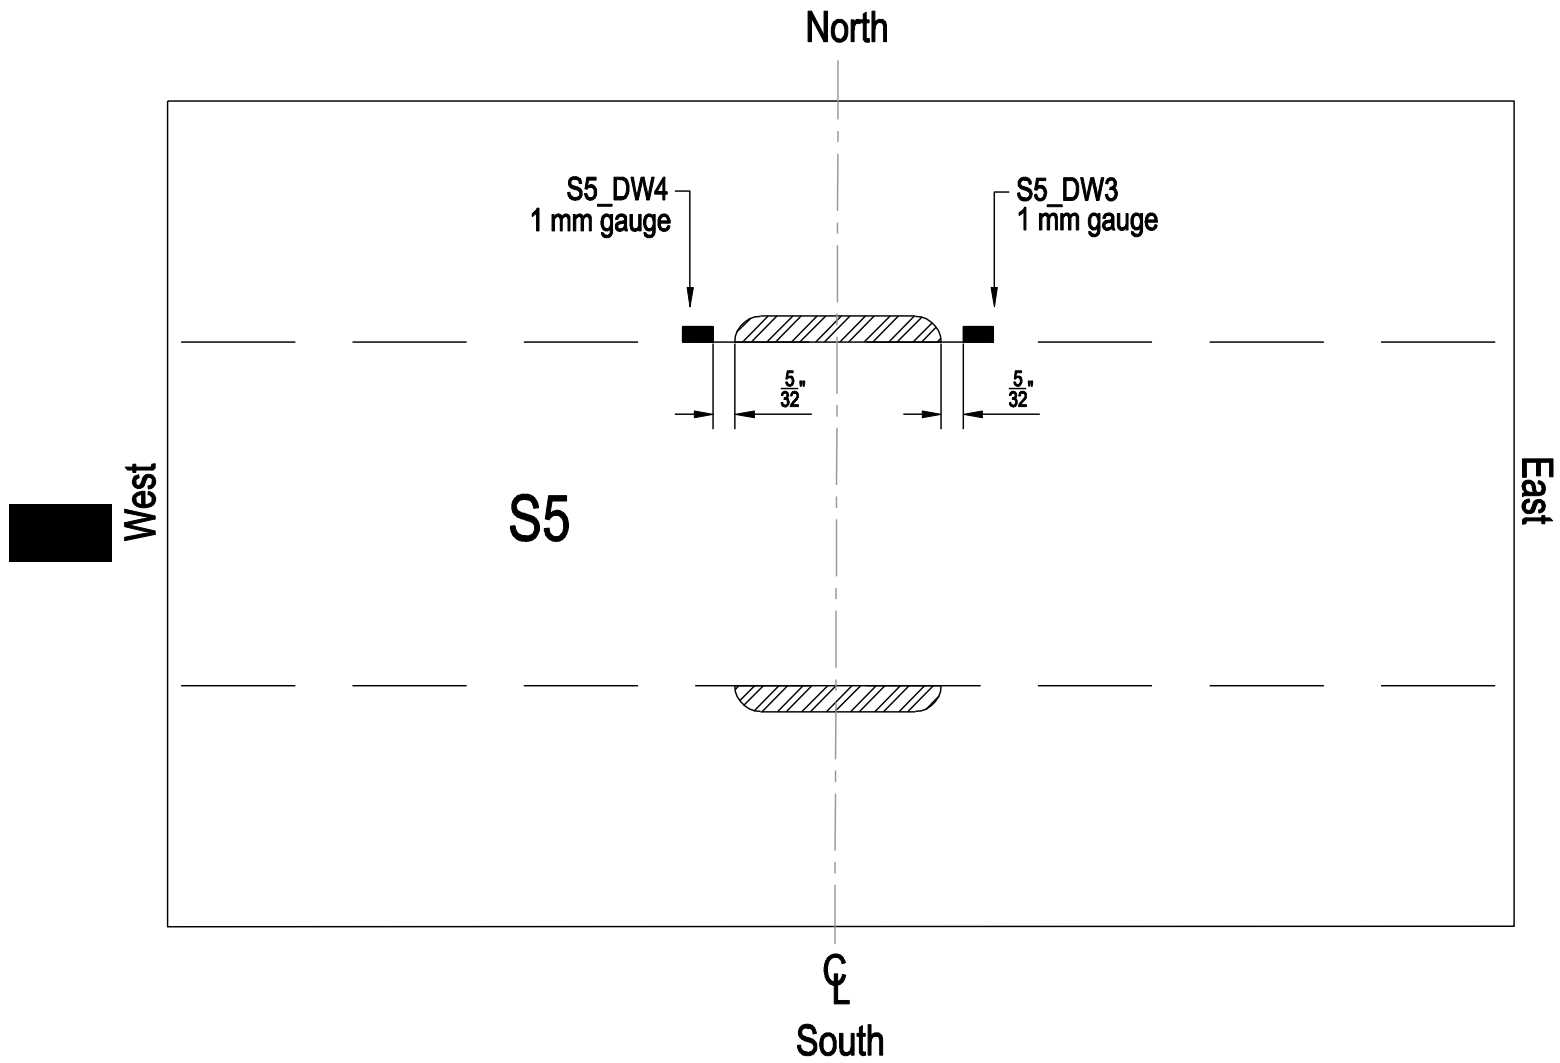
Enlarged view A of Figure 5, strain gauge layout for Specimen #1 of stringer-to-deck welds
